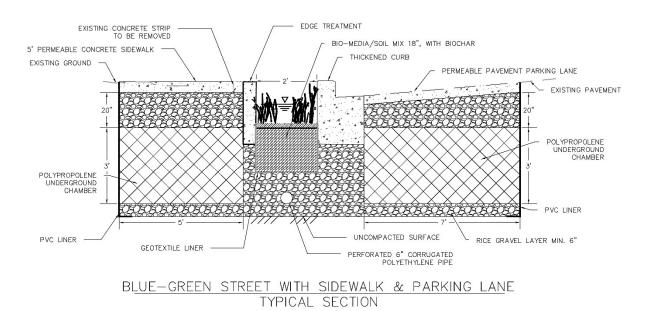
Blue-green street typical section with bio-strip, both permeable concrete sidewalk and permeable pavement parking lane, and two underground storage tanks to maximize storage
